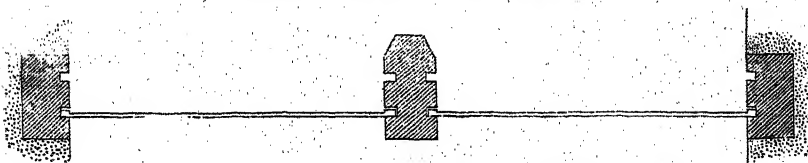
Horizontal Section of Fry Guard, showing one set of panels in position.
